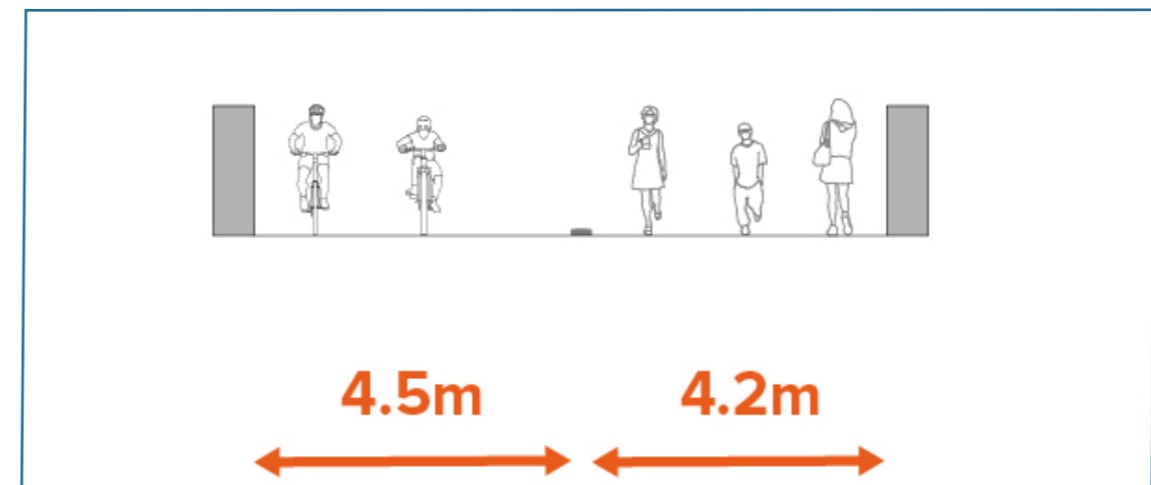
Cross section illustrating the width of the shared use bridge proposed.
